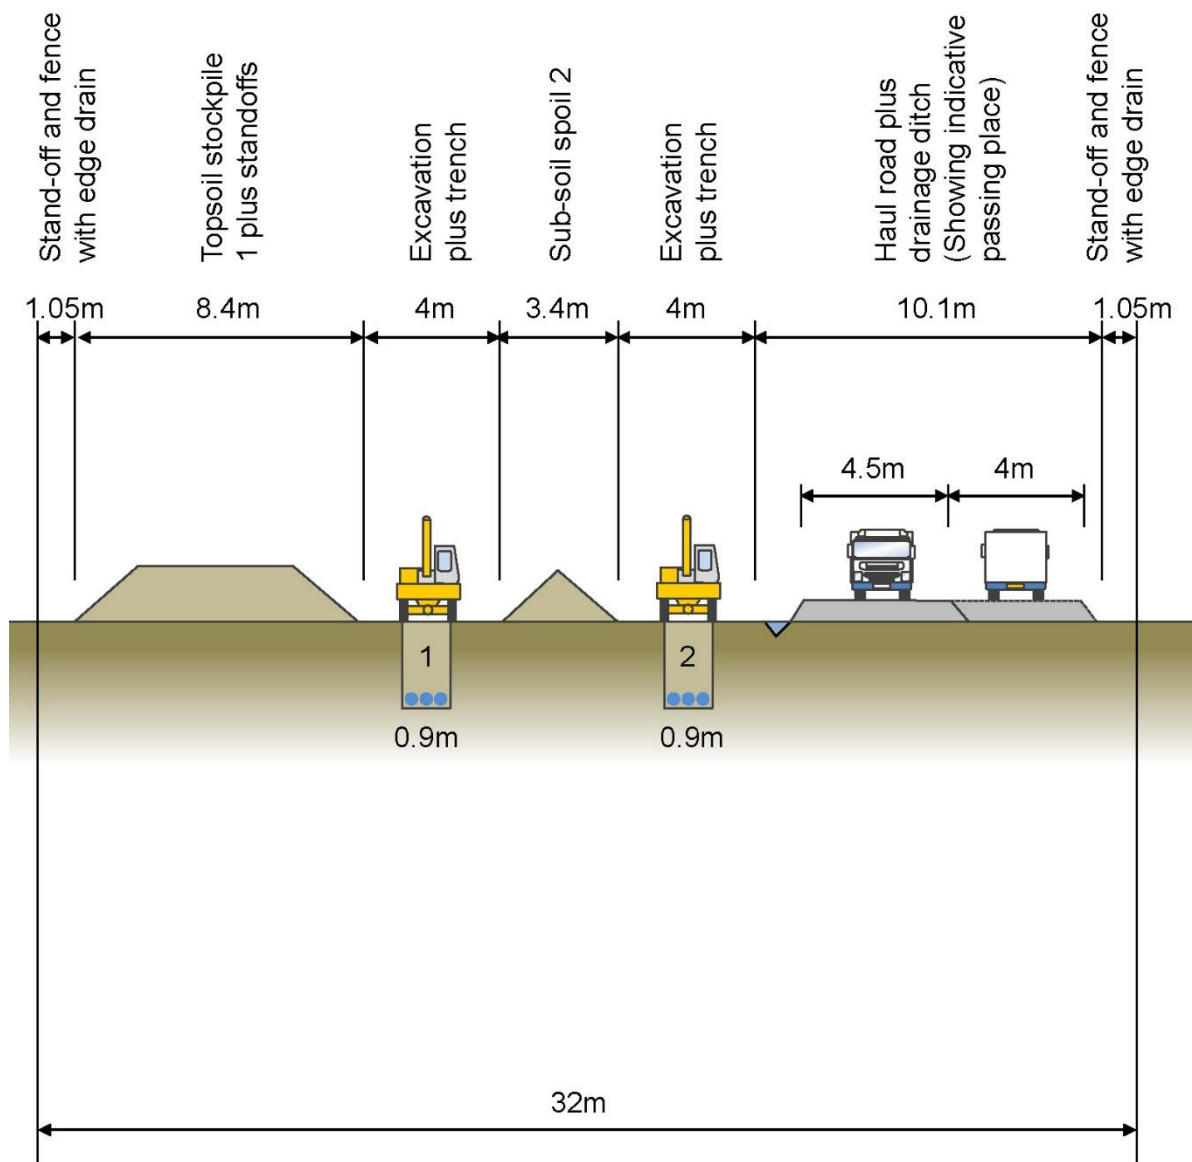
Indicative cable trenching arrangement and working area for typical working width (East Anglia ONE North only)
